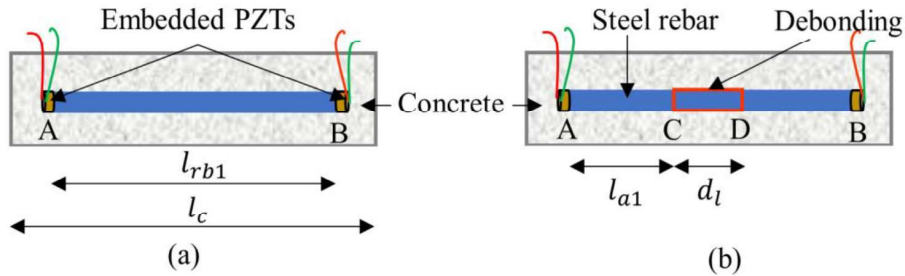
(a) Fully bonded and (b) debonded specimen with embedded rebar ends for heat damage study
